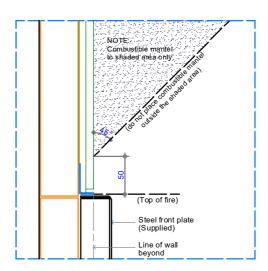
Plan View Fire Surround Opt. 7 Concrete Cavity
